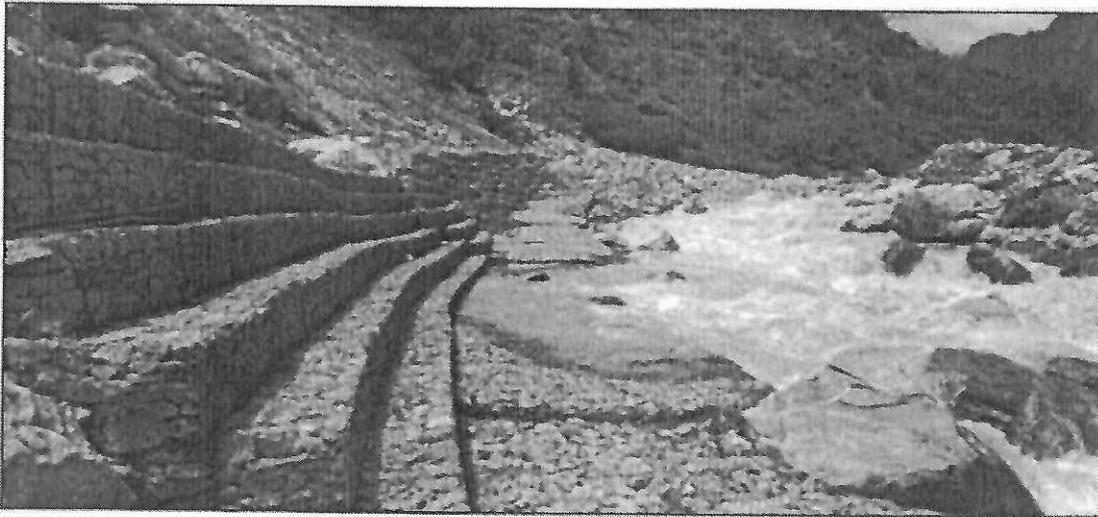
Photograph of Gabion Retaining Wall with Launching Apron on River Bed
